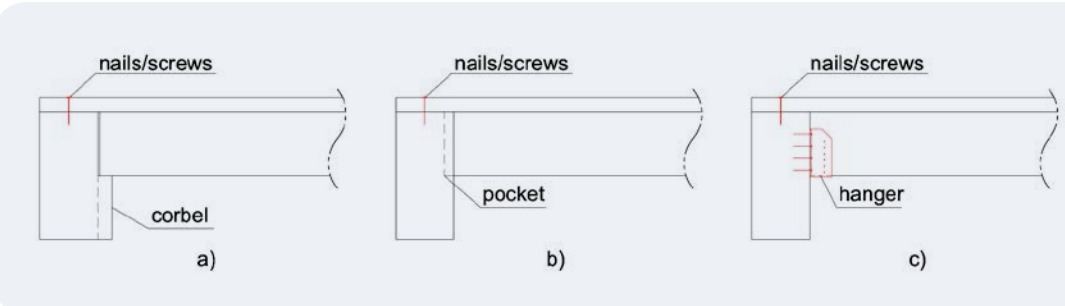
Suggested floor-to-frame connections (floor joists flush with beam): a) floor joist on corbel; b) floor joist in pocket; c) steel bracket/hanger.
